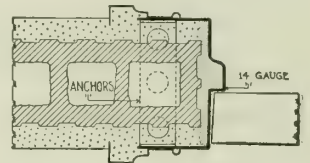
STEEL BUCKS WITH MOULDED STEEL
